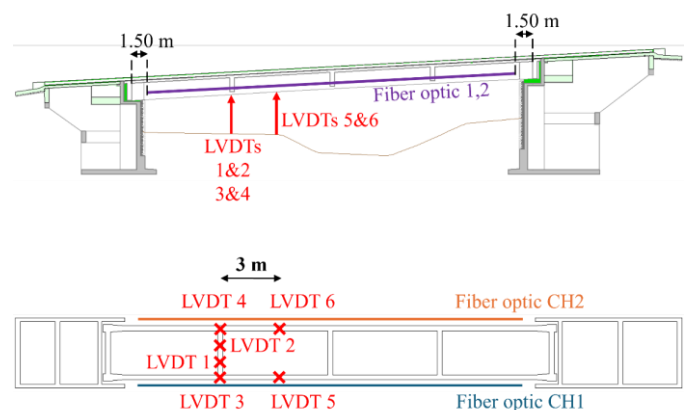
Sensor configuration. (Up) Elevation view; (Down) Plan view.
